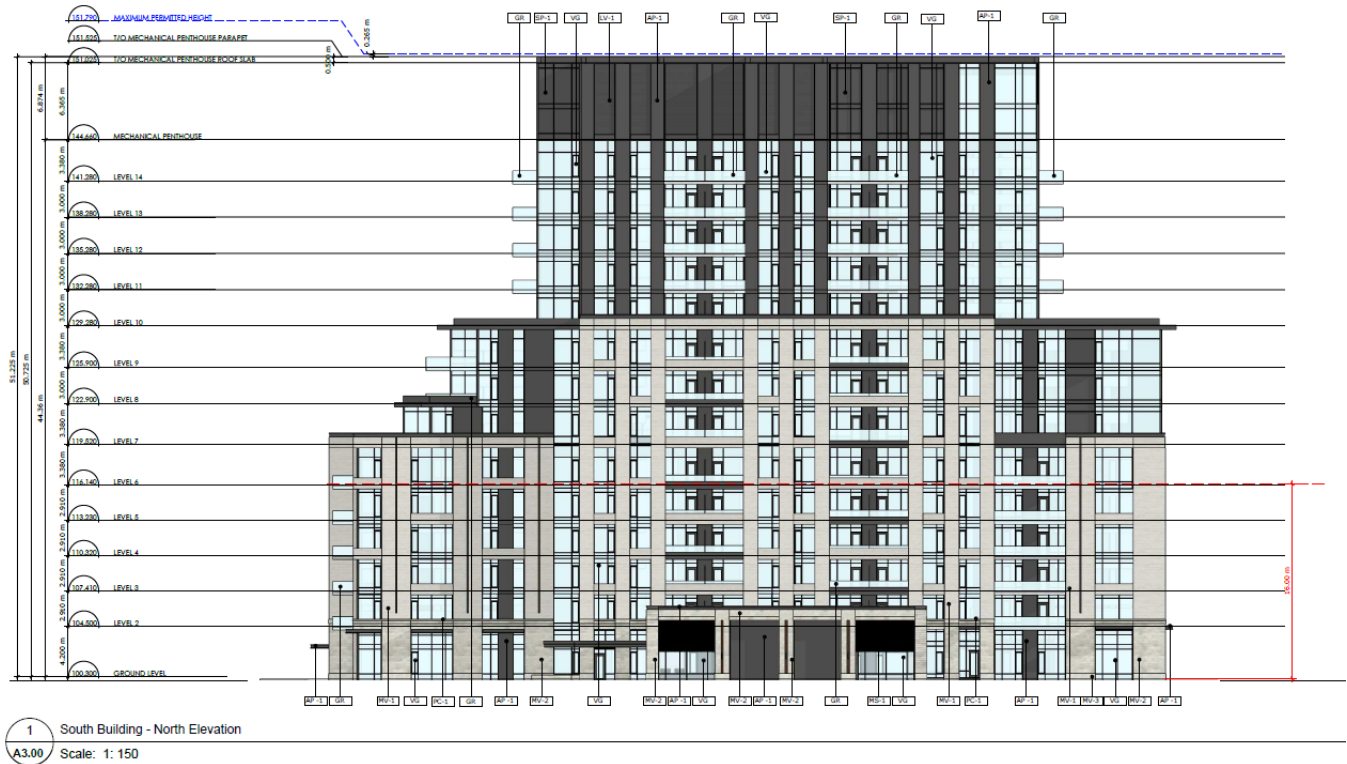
North Elevation (south building) - looking from the north property line, prepared by Hobin Architecture
